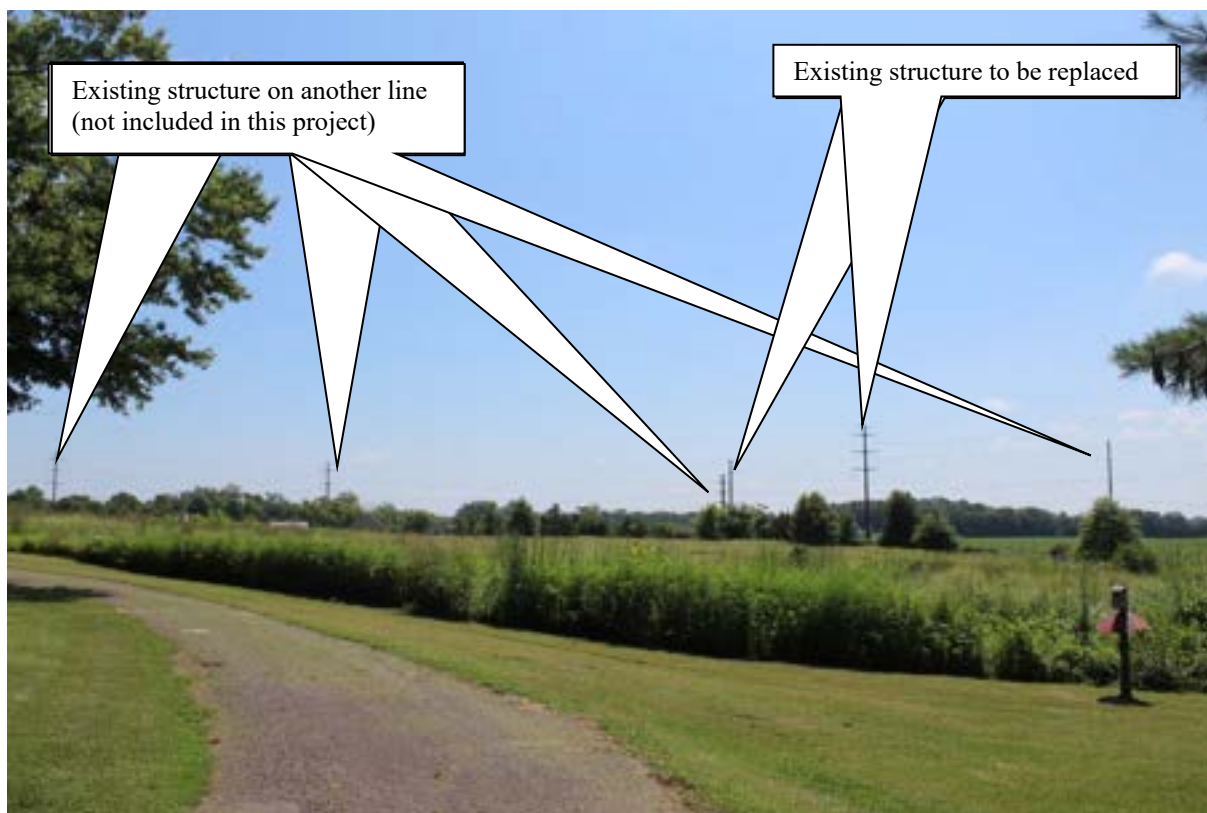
Photo location 12- View from Rose Hill driveway (multiple existing project structures and other structures visible), facing east.
